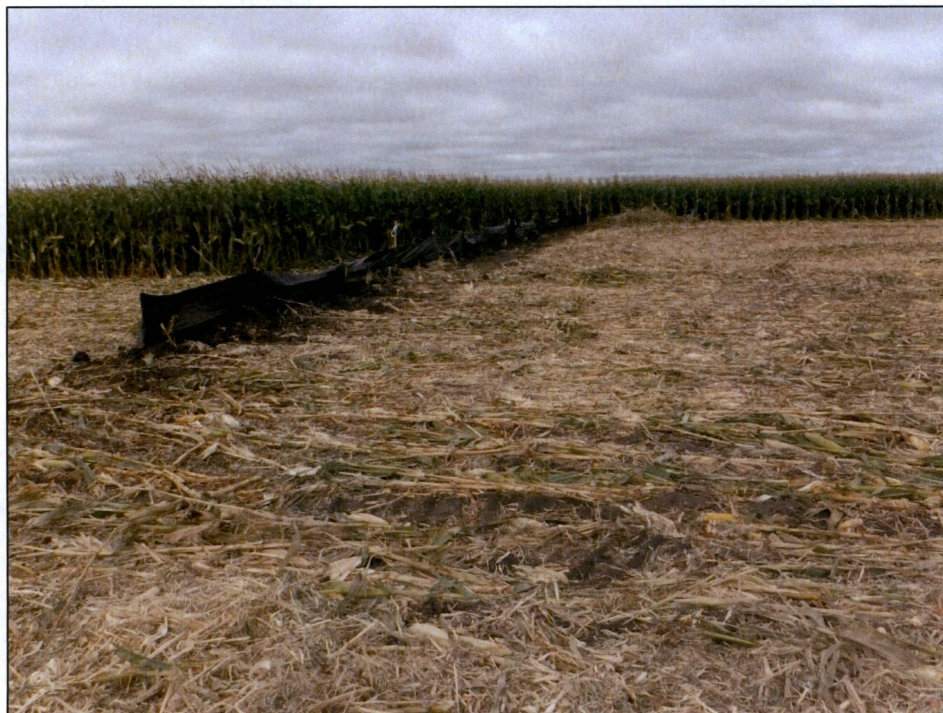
Silt fence installed from Station 141+00 to Station 144+00, looking southwest.
